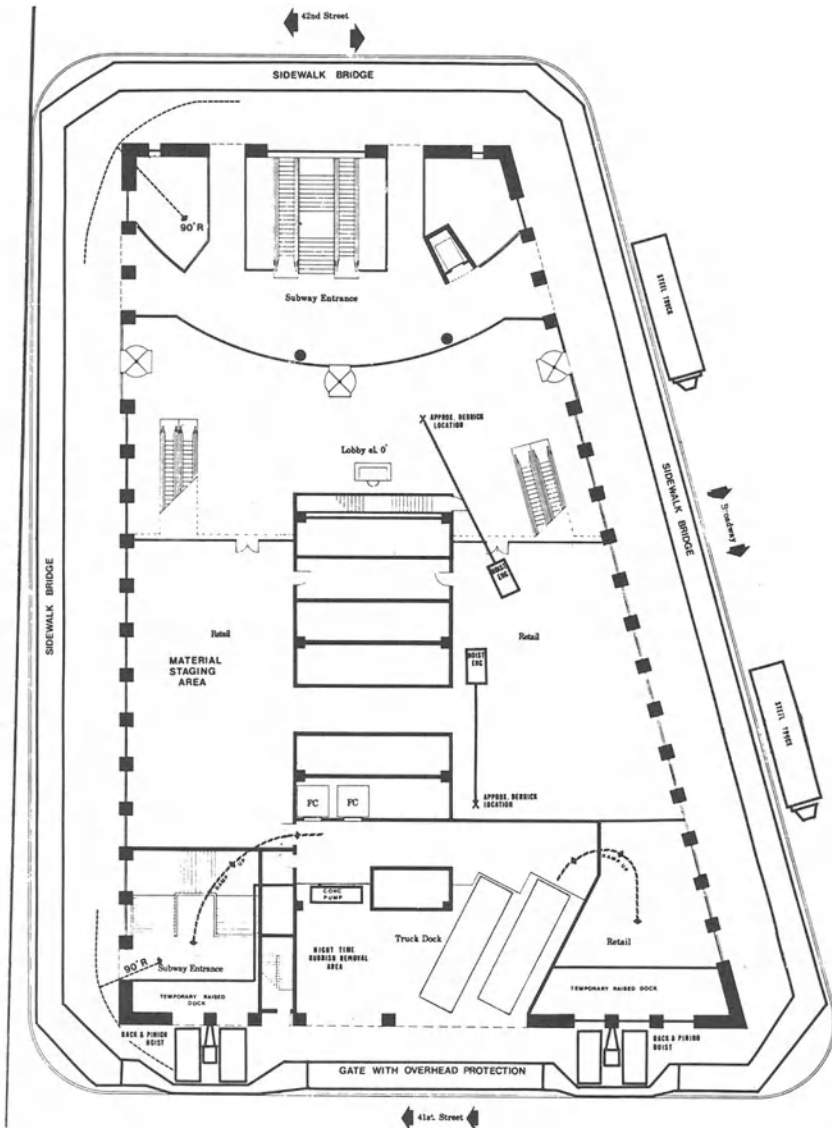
Office tower A plant layout—the Office Center at Times Square
